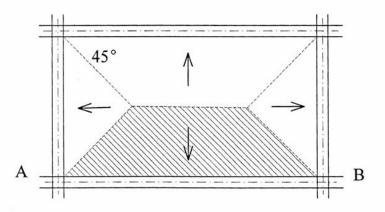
Supporting beams' contributing areas for reinforced concrete floor system.
